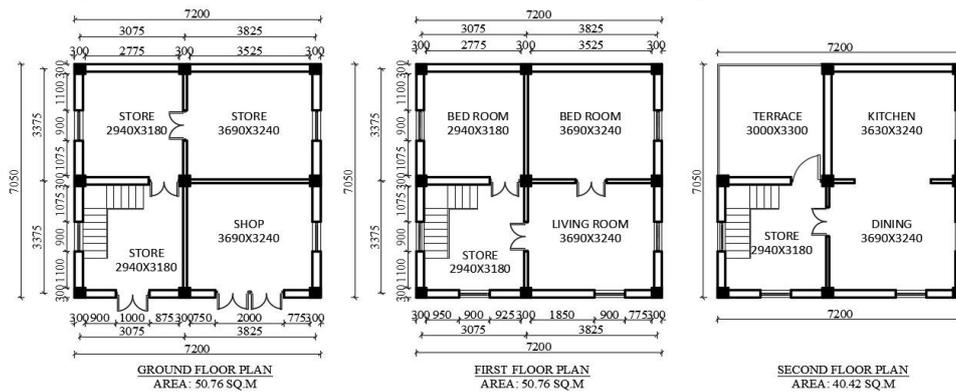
Ground floor, first floor & second floor plan BMC 2.4 RCC
